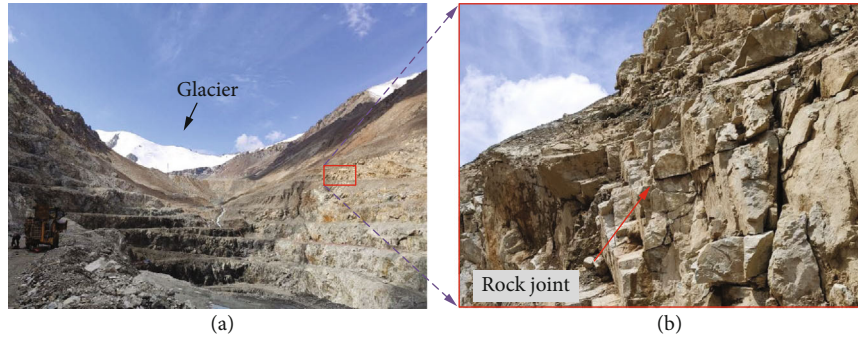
Rock joint sample collection: (a) high elevation slope and (b) massive block structure with rich joints of the natural slope.
